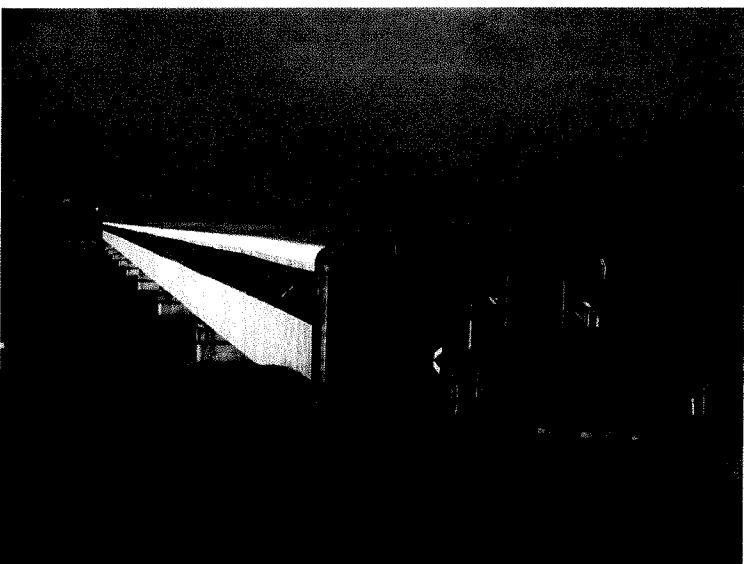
Example of typical wetland crossing (conveyor suspended on pillars, covered and with solid floor for collection of coal spills)
